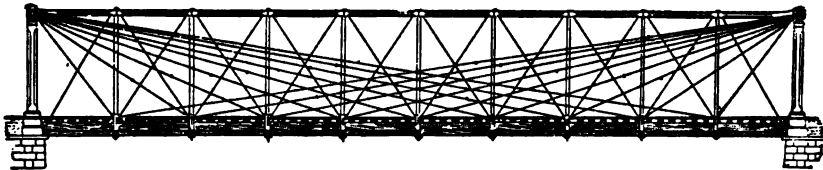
The Bollman Patent Iron Suspension Truss Bridge.
